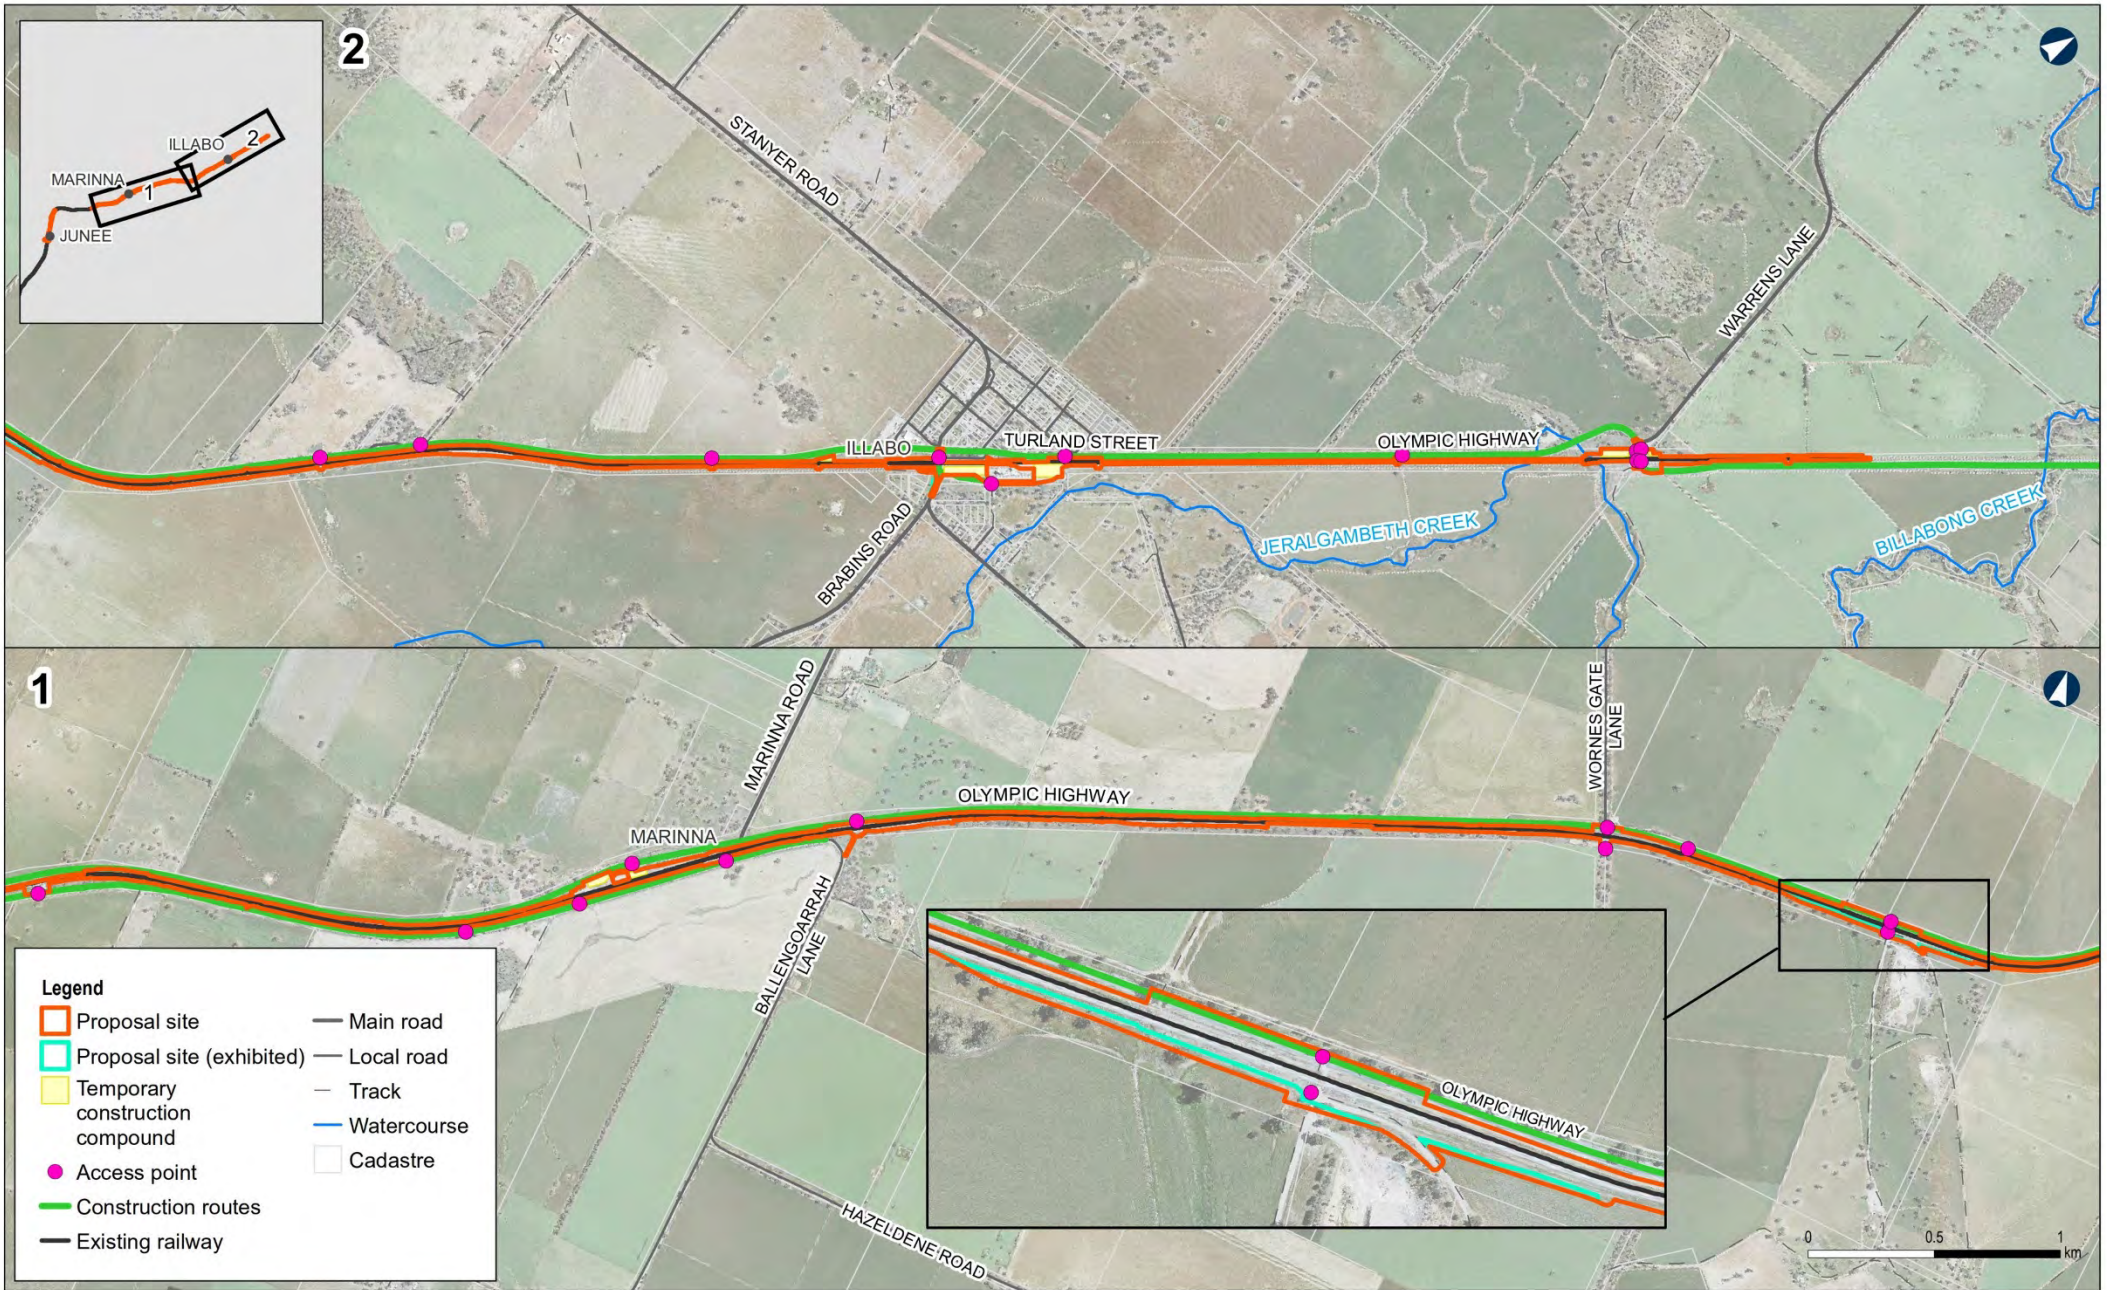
Revised Construction layout of Junee to Illabo clearances
